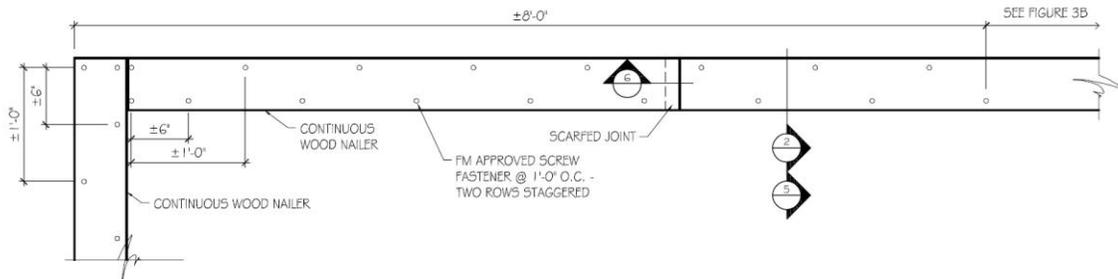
A - WOOD BLOCKING CORNER ANCHORAGE 8'-0" FROM CORNER
